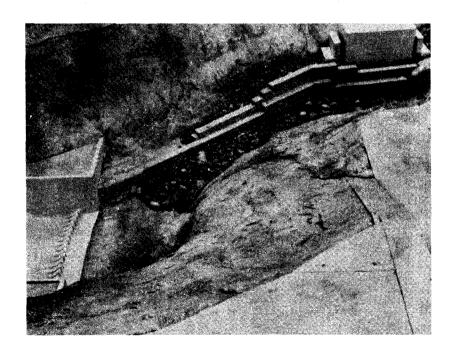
View from right bank without removable topography, or as shown in specifications drawing. P801-D-80171
